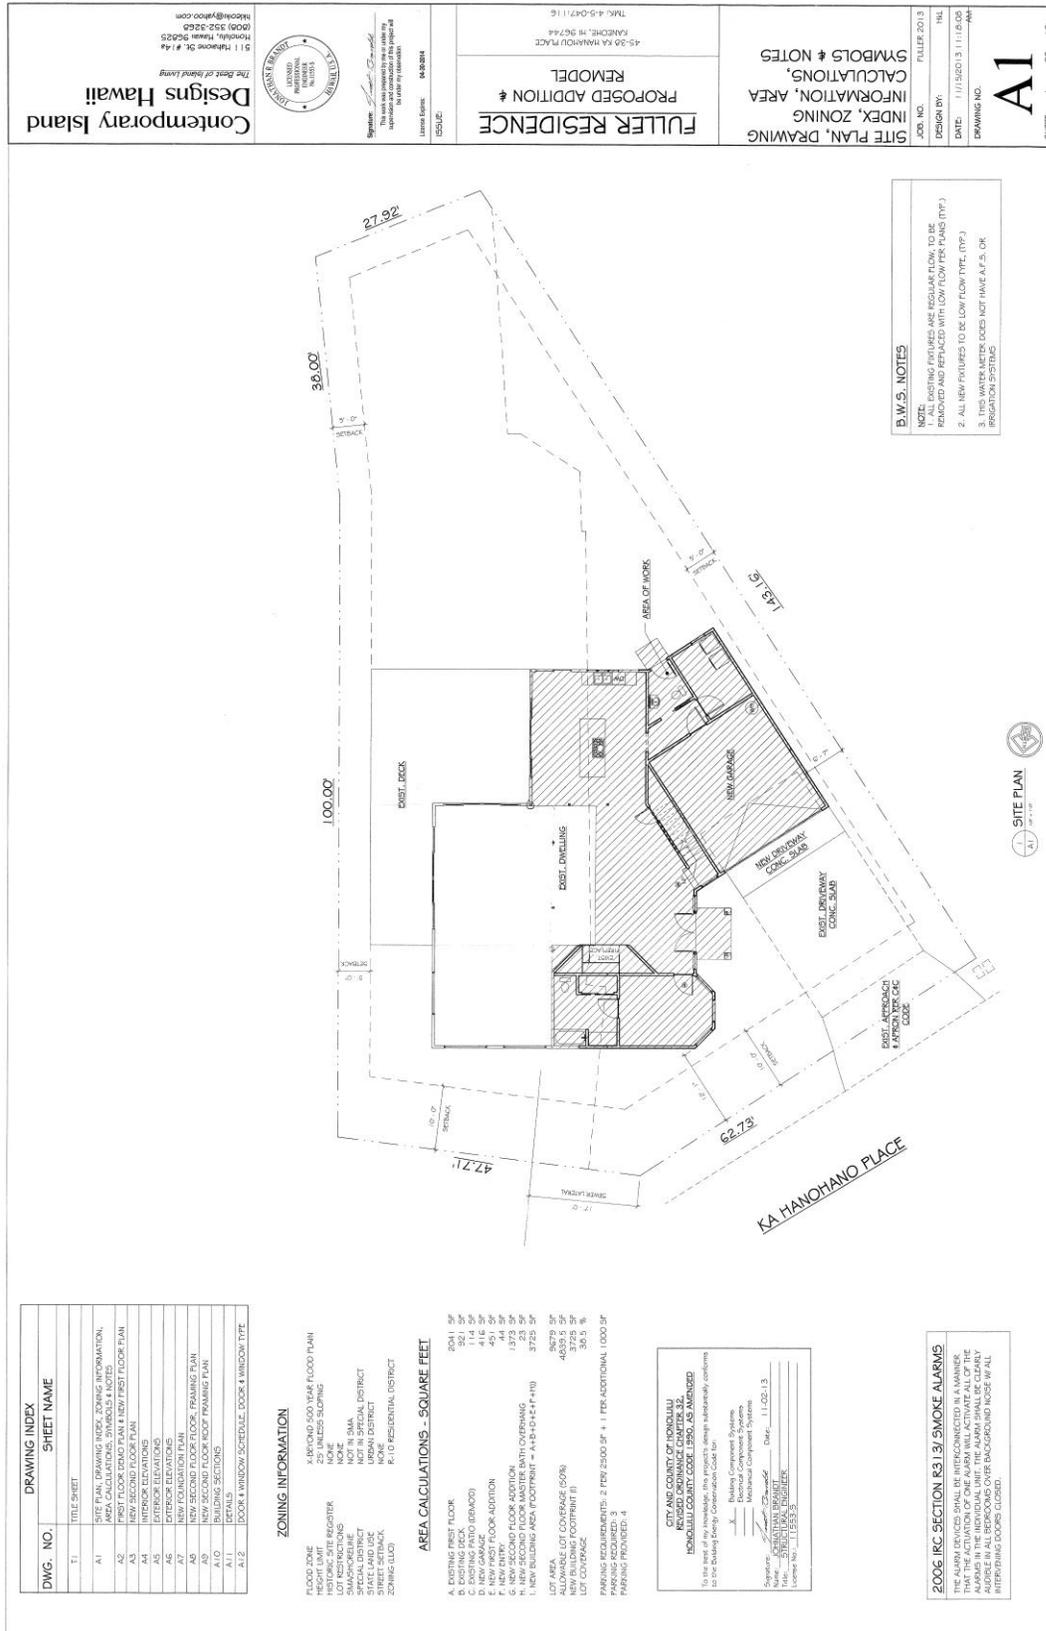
Fuller Residence Site Plan, 2nd Floor (Approved)
